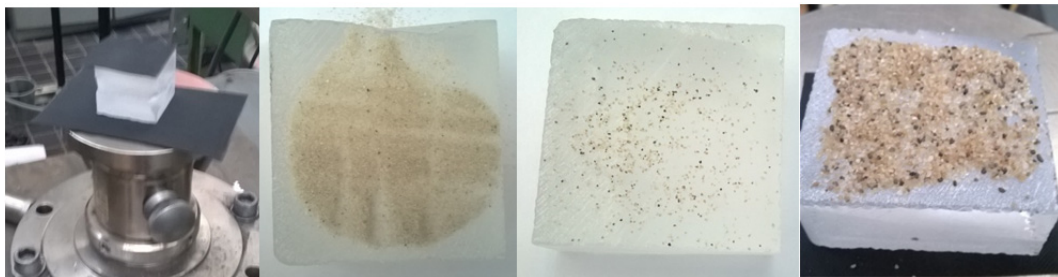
exploratory experiment with sand between contact surfaces of glass blocks; fine, medium and coarse
